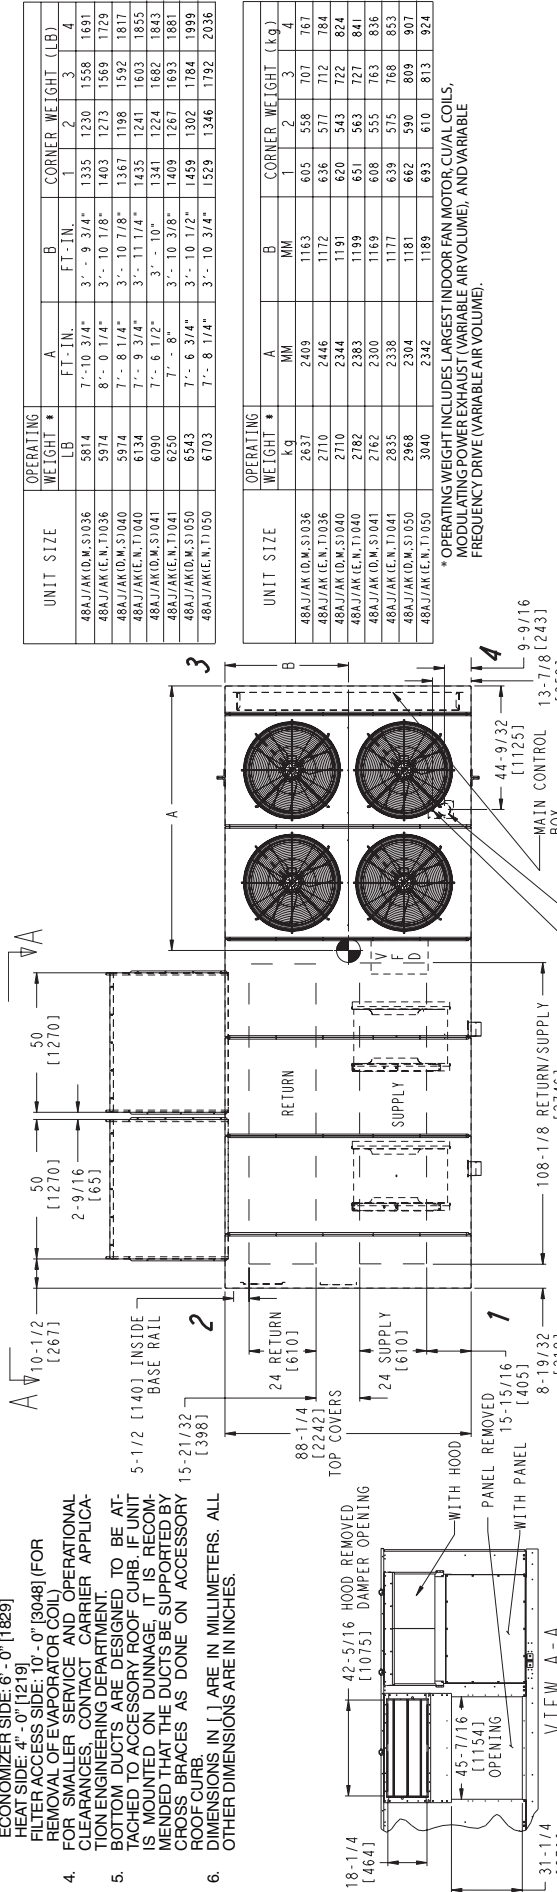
Base Unit Dimensions — 48AJ, AK020-035
